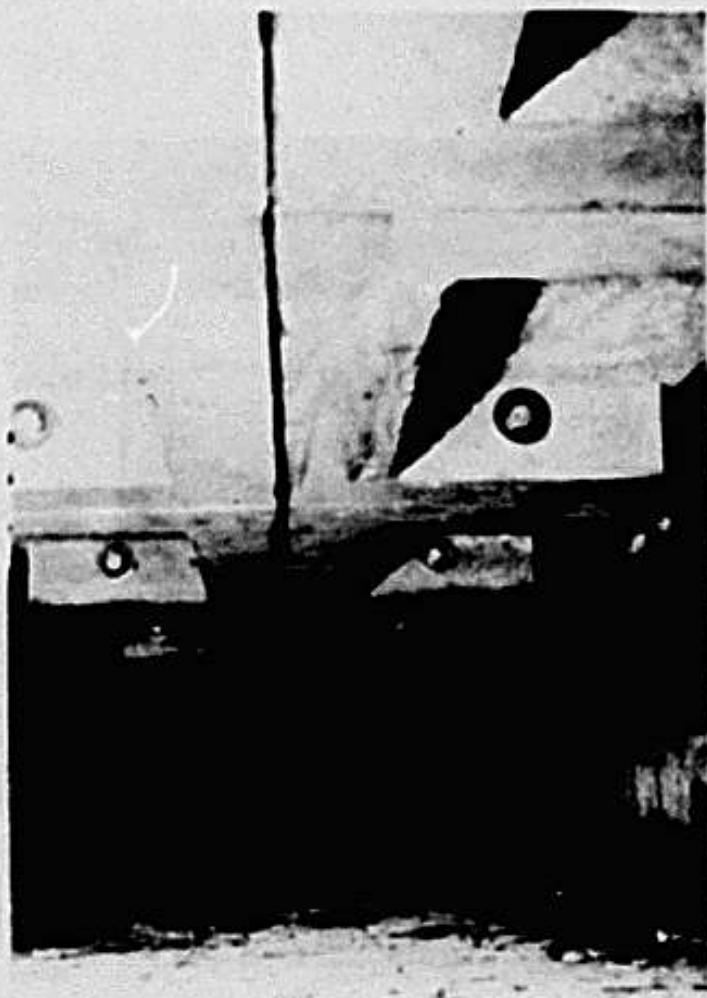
VIEW OF TEST SPECIMENS INSIDE THE FIRE CHAMBER BEFORE TEST
